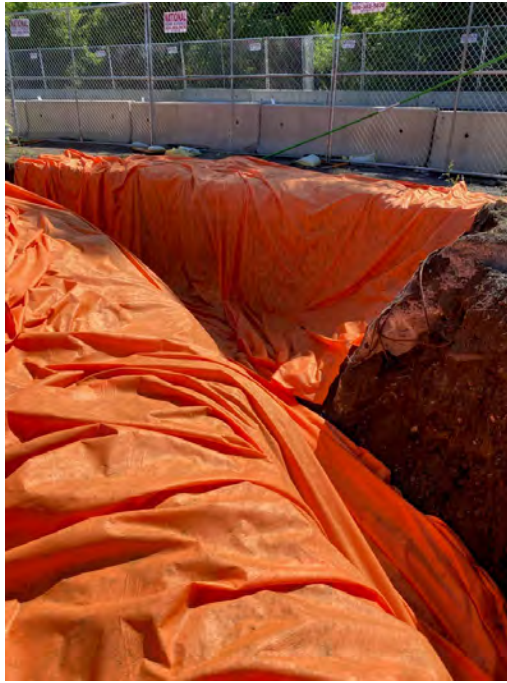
View looking north. Photo depicts trench excavation activities on Area 3 and exposure of concrete foundation walls on Area 2 (vicinity of Sta. 13+00). (Photo Taken 7/12/2022).
